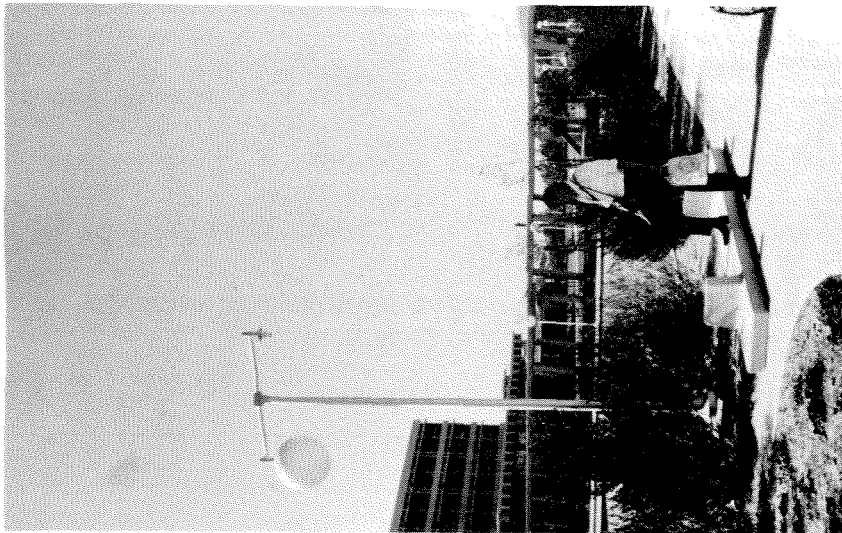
Overturned bench and damaged light standard at Olive View Hospital.
